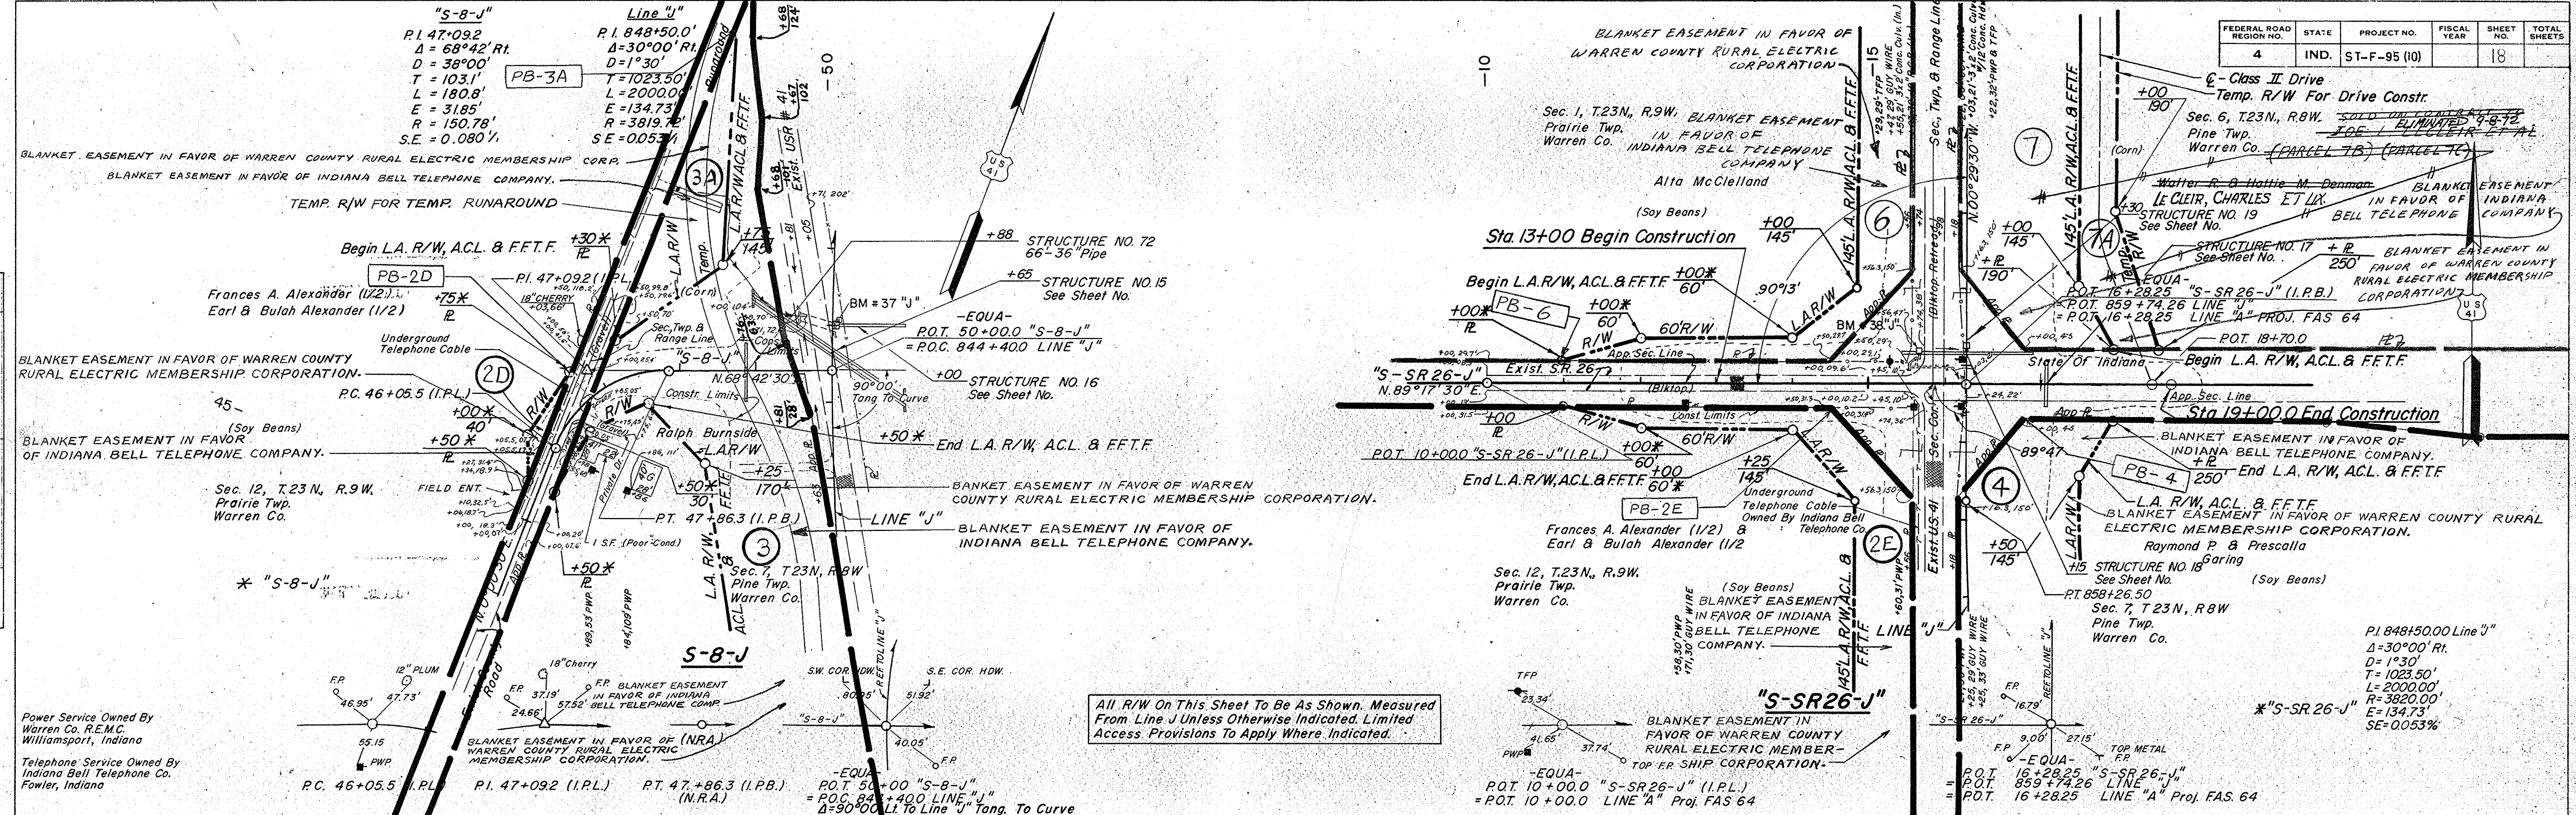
PLAN - PROFILE & R. R. STANDARD
